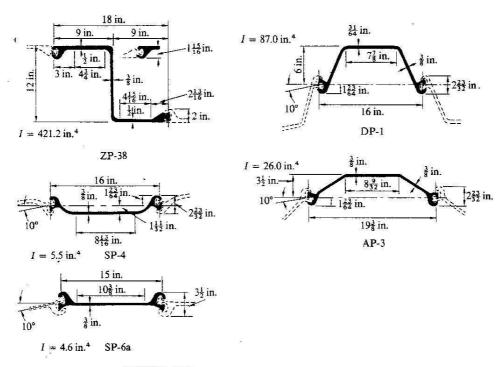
Typical sheet-pile sections and moments of inertia. (Bethlehem Steel Corp.)
